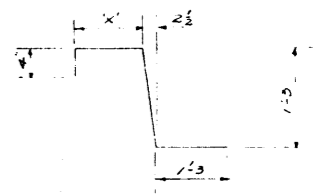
DETAIL AT INTERMEDIATE FLOOR BEAM
